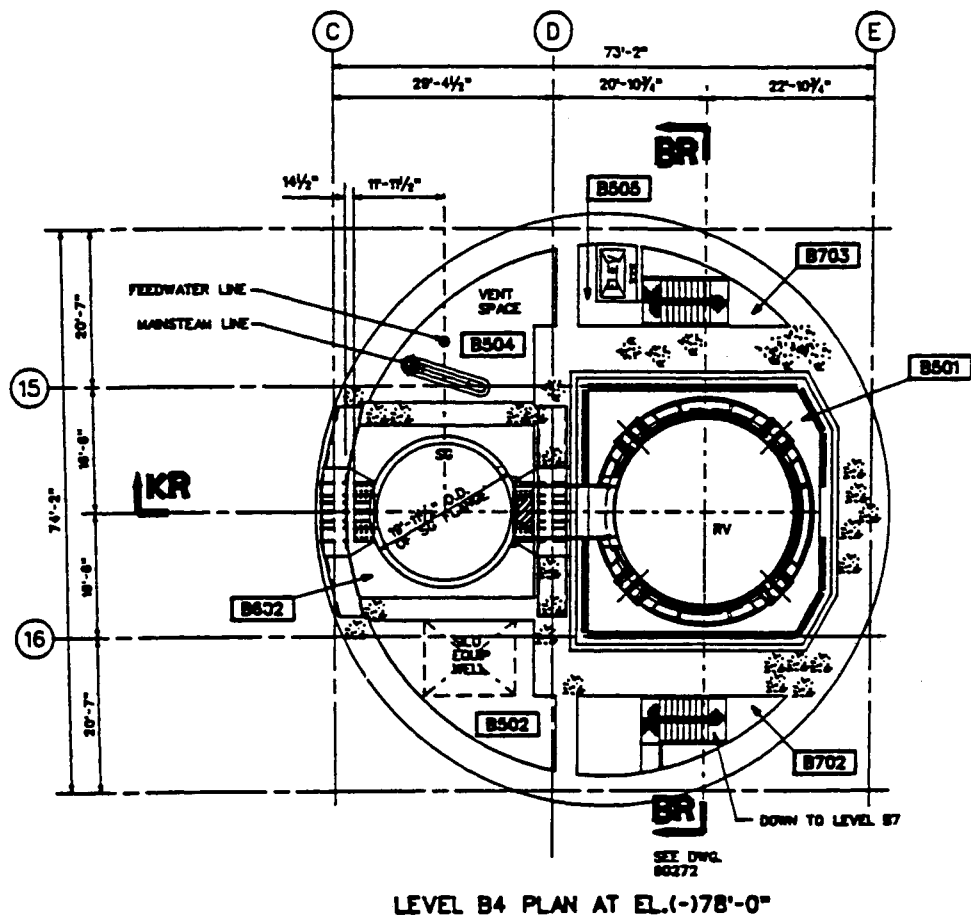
REACTOR BUILDING - PLAN AT CROSS VESSEL ELEVATION
